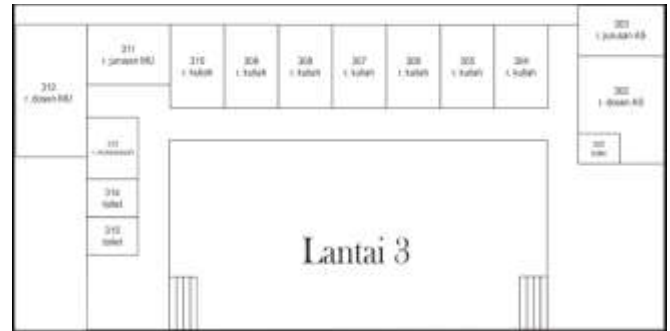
Floor Plan of 3rd floor of Faculty Sharia & Law
